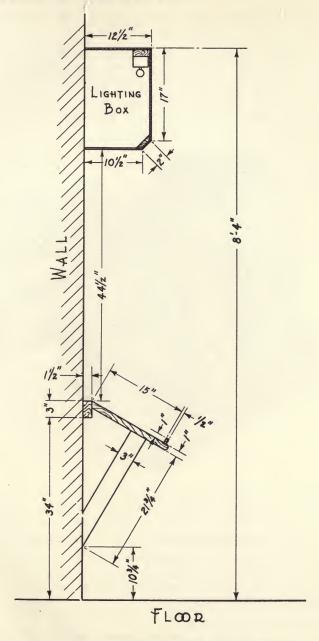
WALL CROSS-SECTION OF A CHART EXHIBIT.
